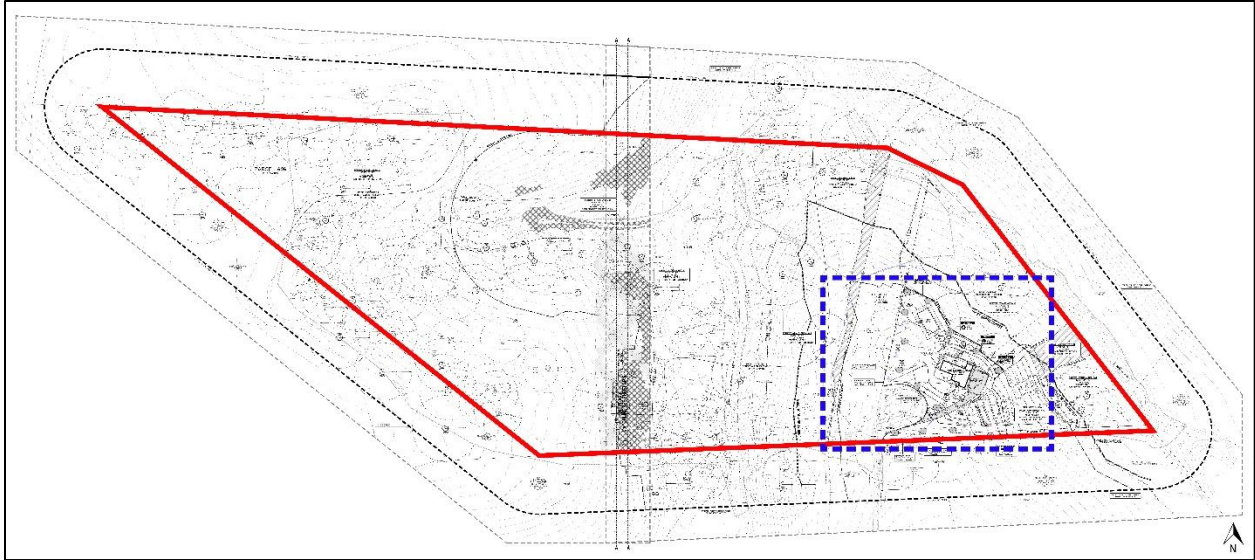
Administrative Subdivision Plan (enlarged area in blue)
